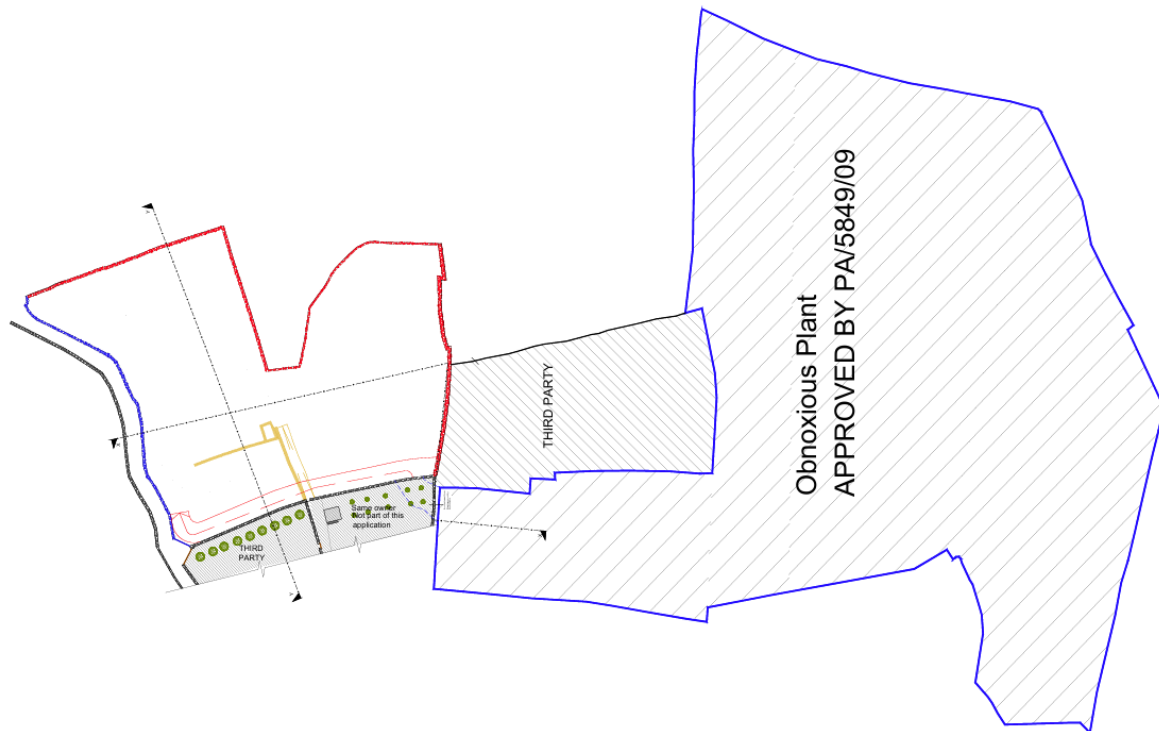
Block plan of the proposed development for Zone A (Source: PDS February 2026).
